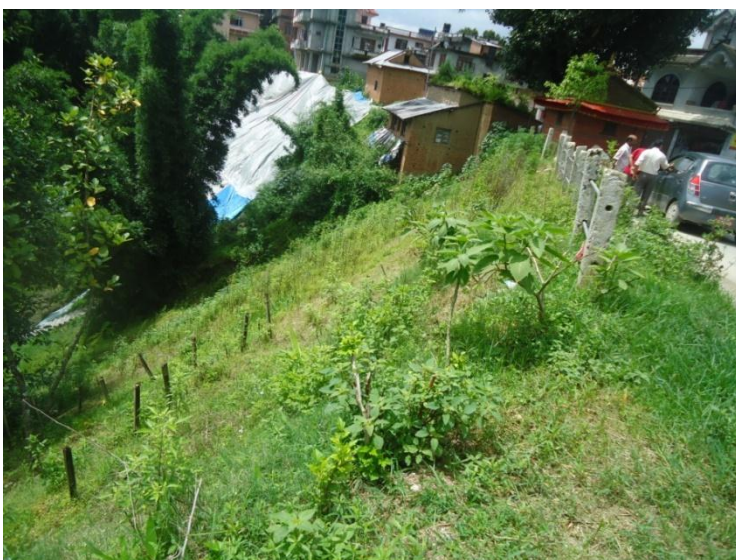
Photo of the stabilized slope. Although the newly constructed road section is stable, the adjacent areas have started to slide. The local people covered the area with plastic sheet to protect it from rain water in order to prevent further landslide.
